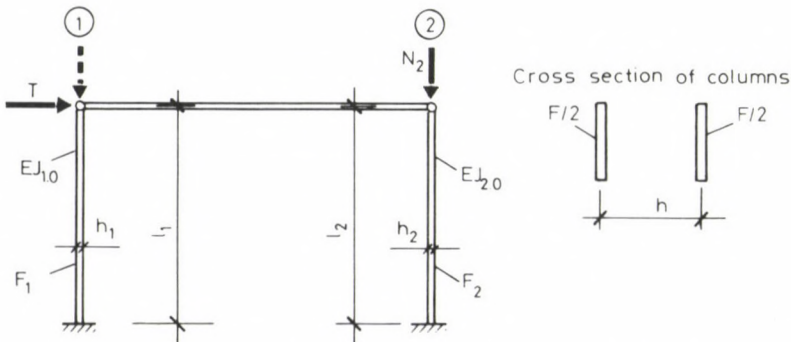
Bar system consisting of bars of sandwich cross section where normal force is acting upon bar 2
